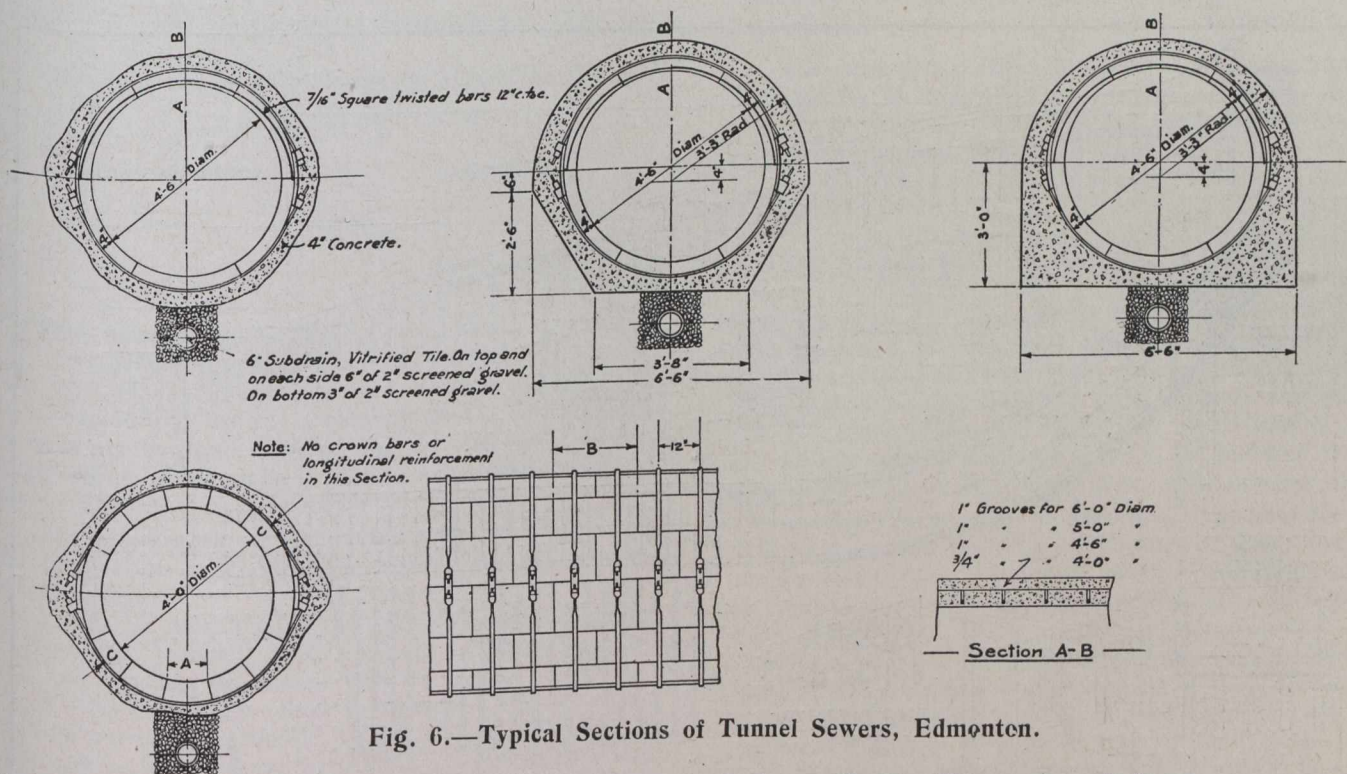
Typical Sections of Tunnel Sewers, Edmonton.
